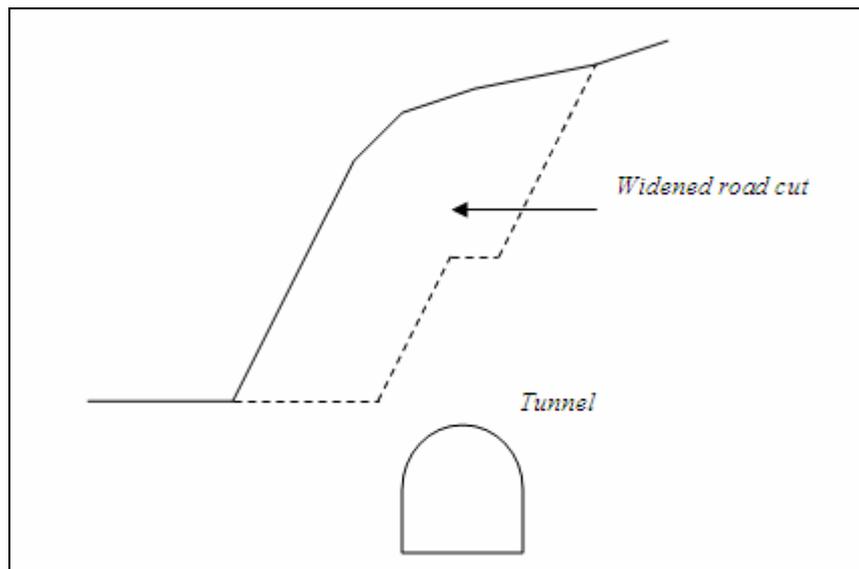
Tunnel beneath a road cutting which was subsequently widened
